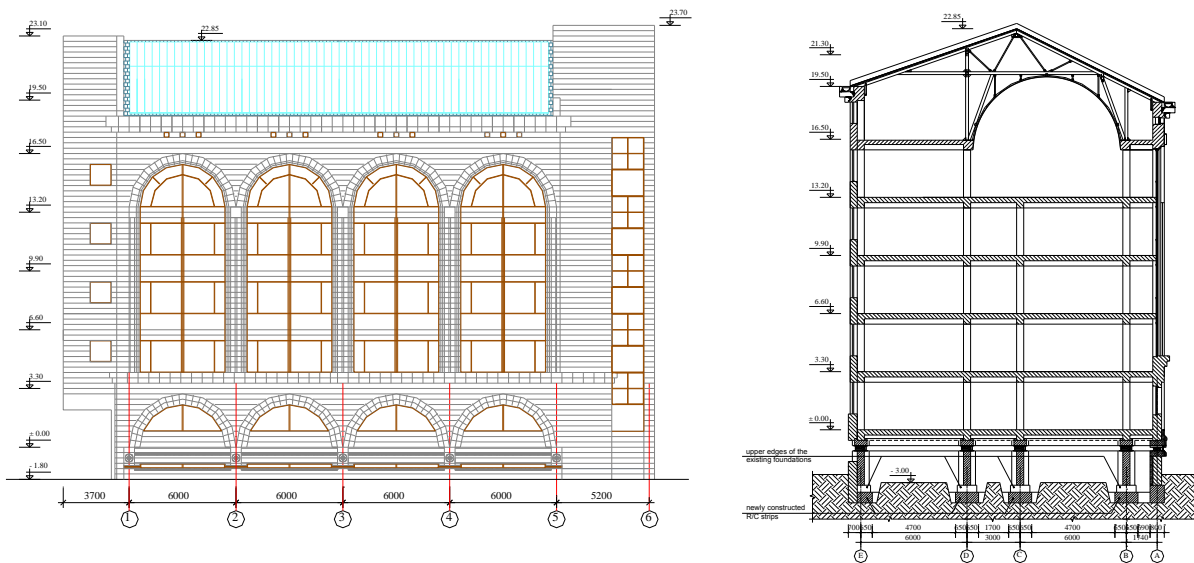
Design view of the retrofitted AAWC and its vertical elevation.
